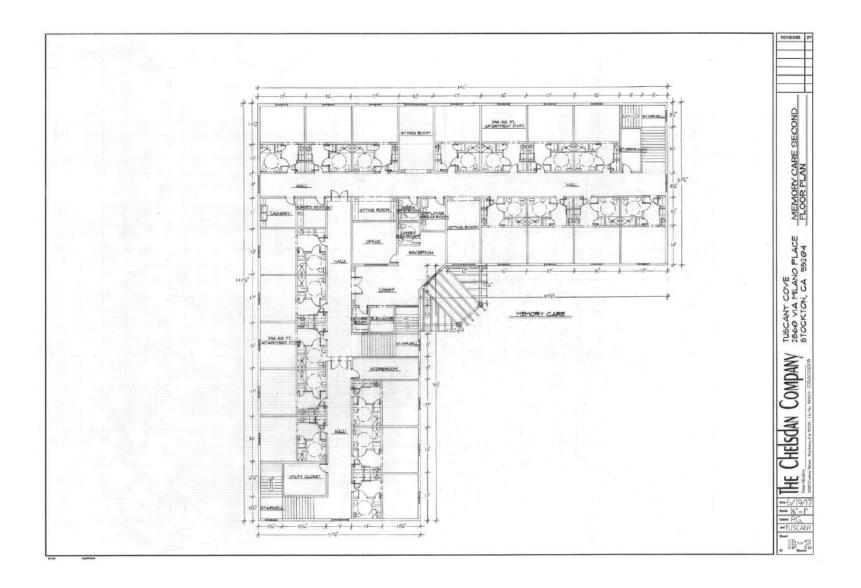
MEMORY CARE BUILDING, FLOOR 2
